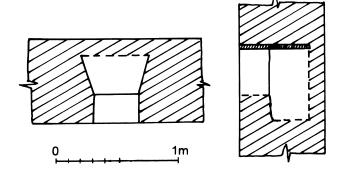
Helions Bumpstead St. Andrew, reconstructed plan and section of probable aumbry.
